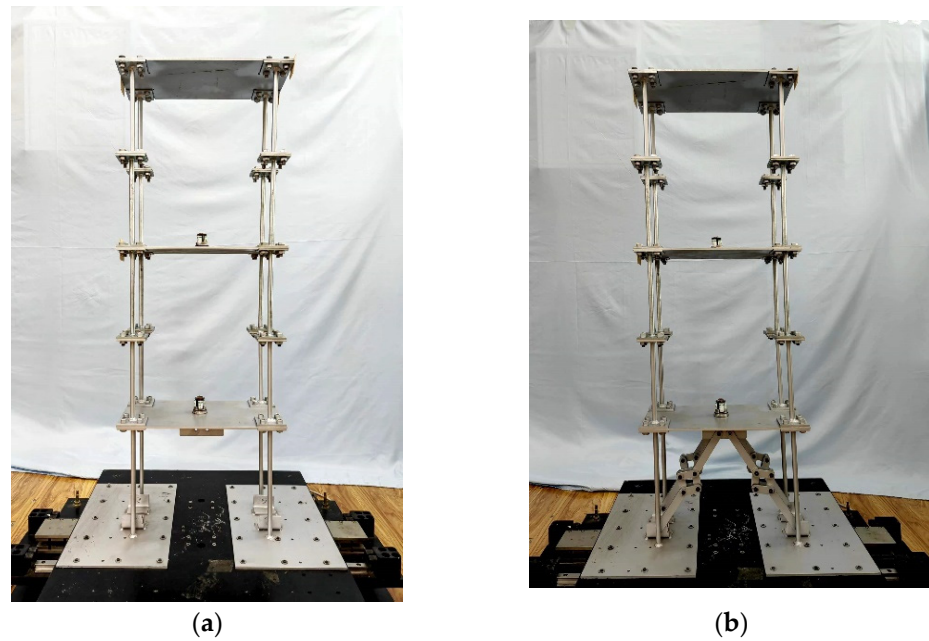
Model specimens. (a) Frame model specimen. (b) Friction damper braced frame specimen.
